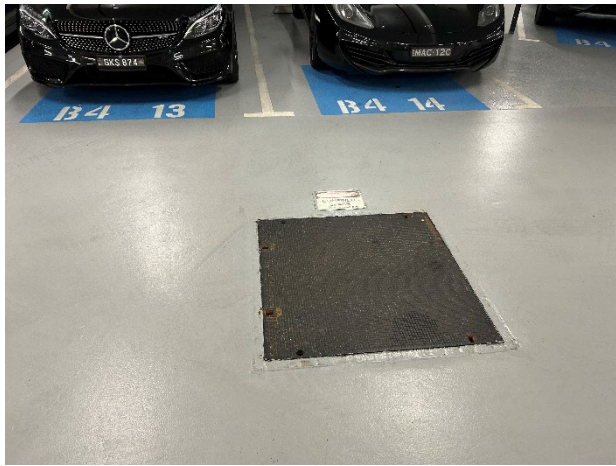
Level B4, carpark, adjacent parking space 13 – unknown pit.
